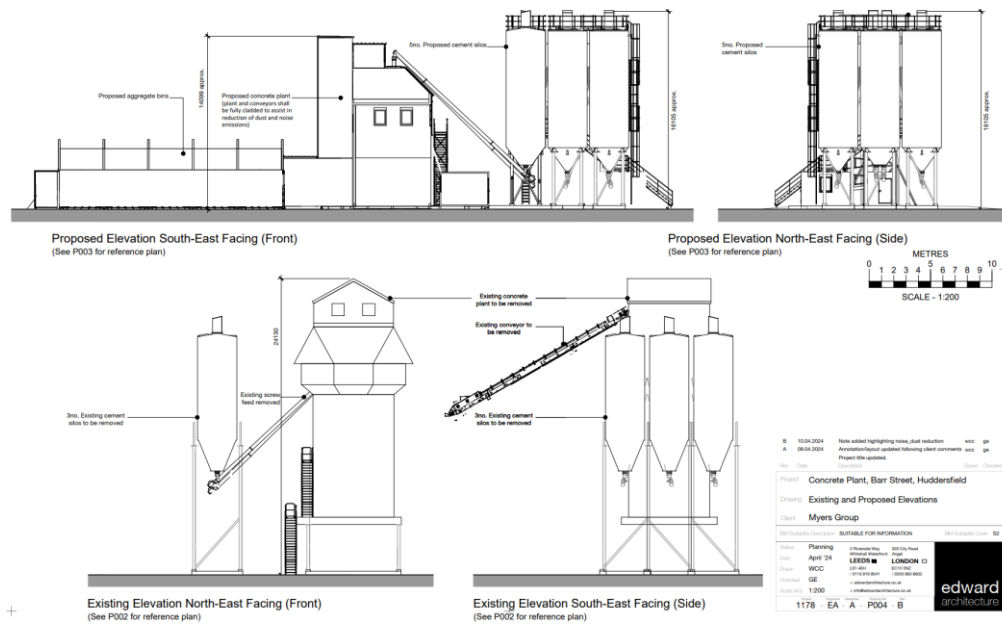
Existing vs proposed elevations (courtesy of Edward Architects)
